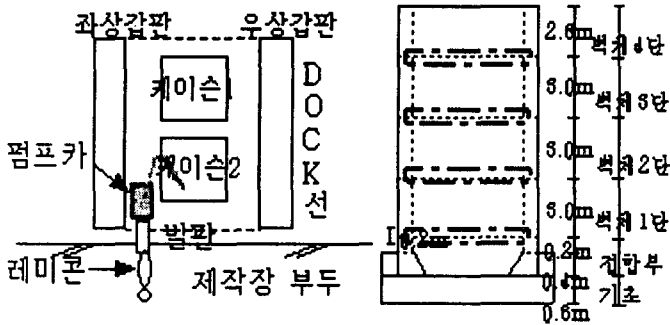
Layout plan of pumpcar casting and stagnant water plate diagram
